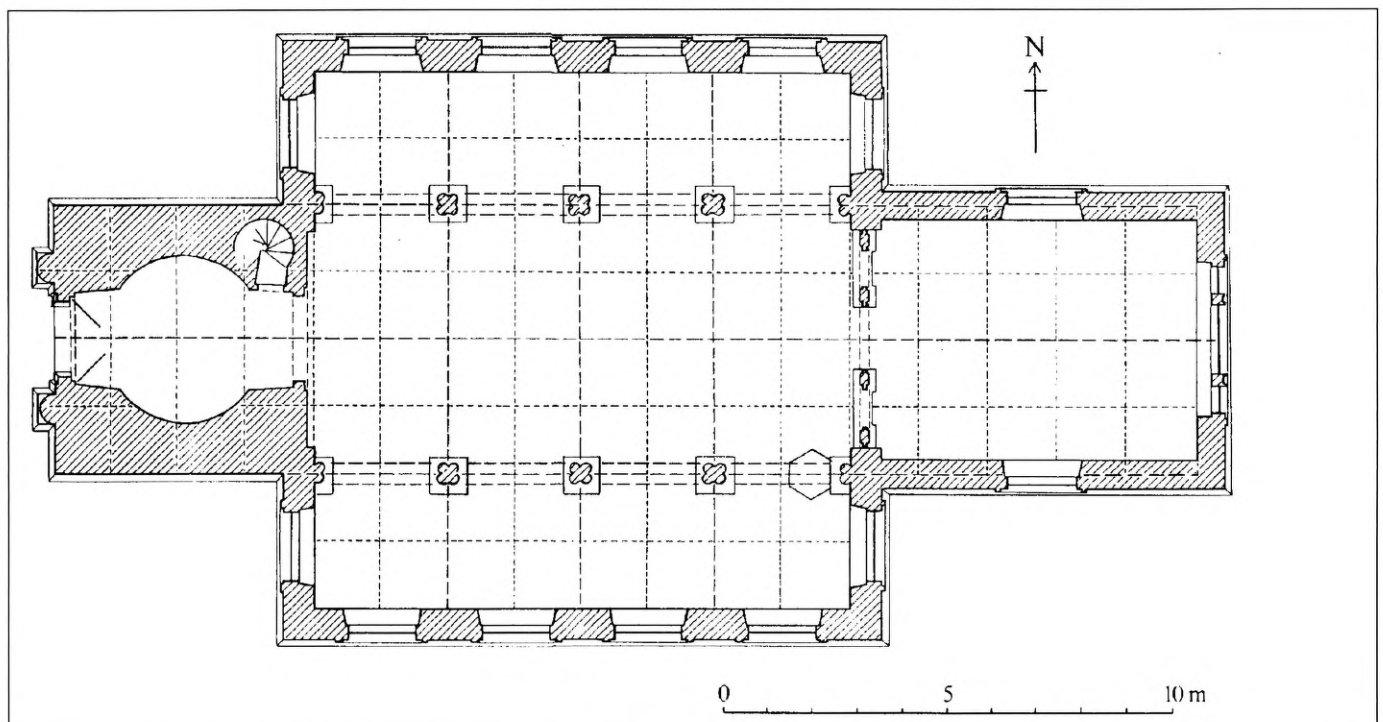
Plan of St Mary's Church against a 5 feet interval grid.
